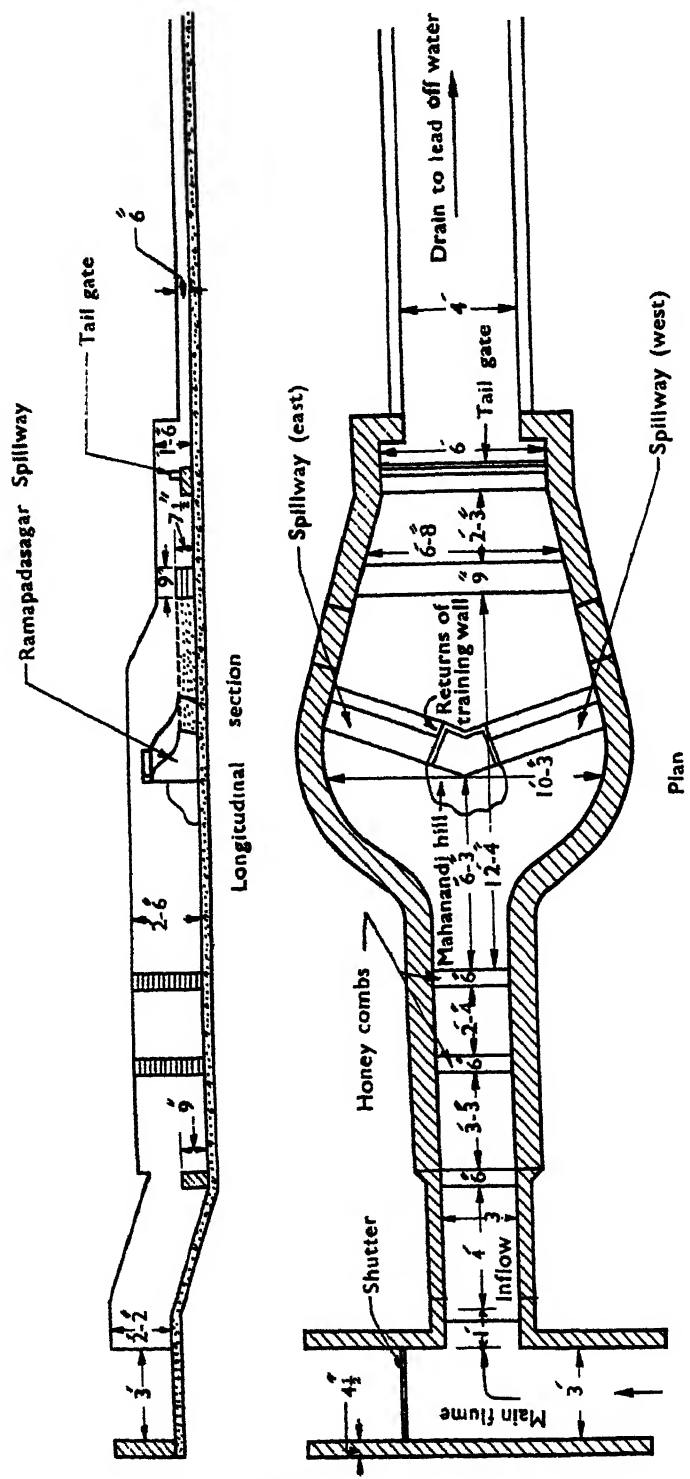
C.14: Showing layout of model, Ramapadasagar Spillway Dam
